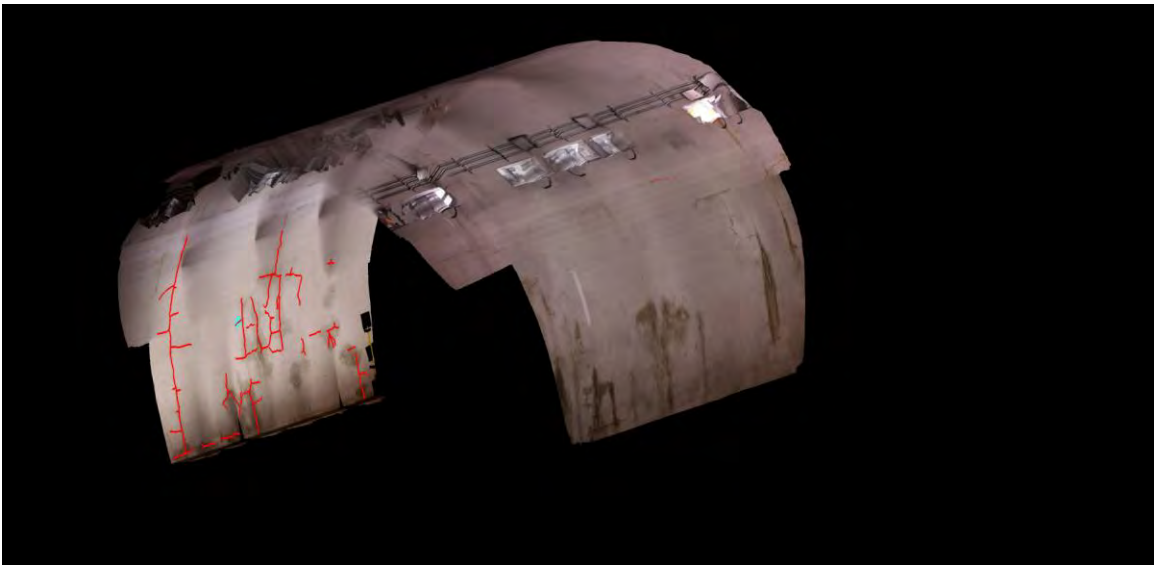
Overall view of a tunnel stretch by the southern portal with digitized cracks on left wall.
